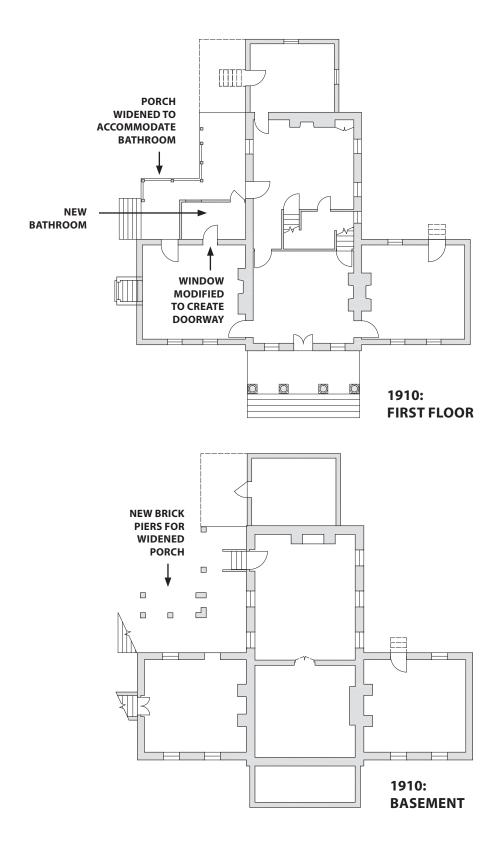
(Left and above) Floor plans showing changes to the main house by 1907.
